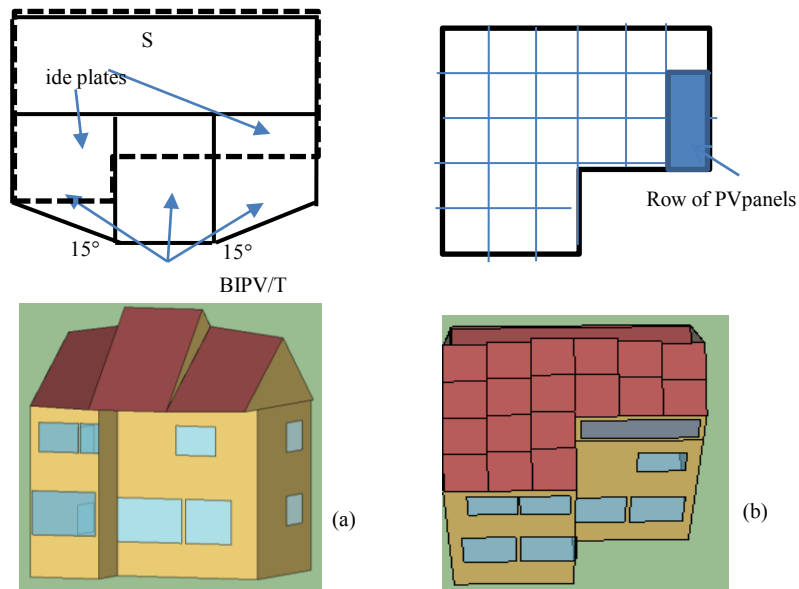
, (a) rectangular roof, (b) roof with the recess cut out
